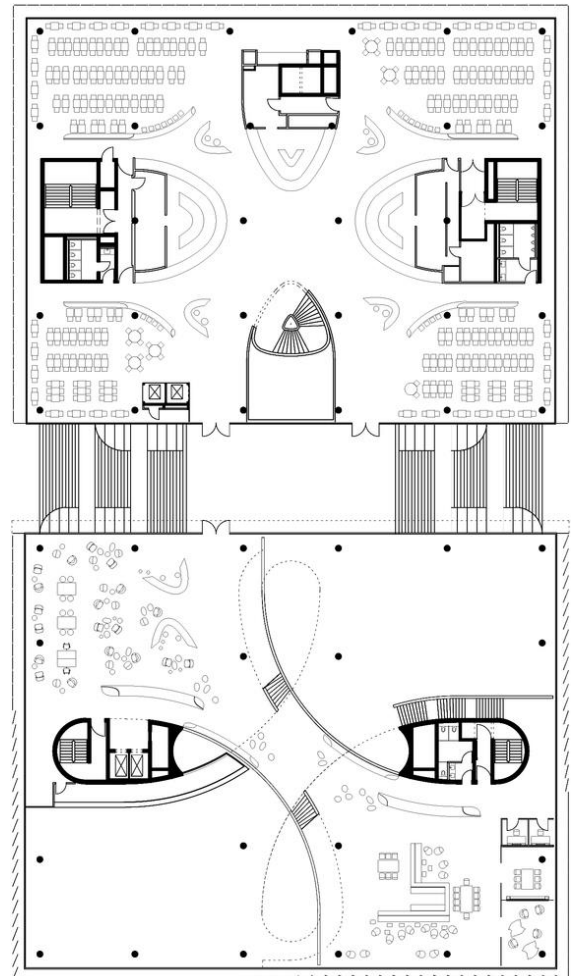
FIRST FLOOR PLAN (HENN, 2018)
